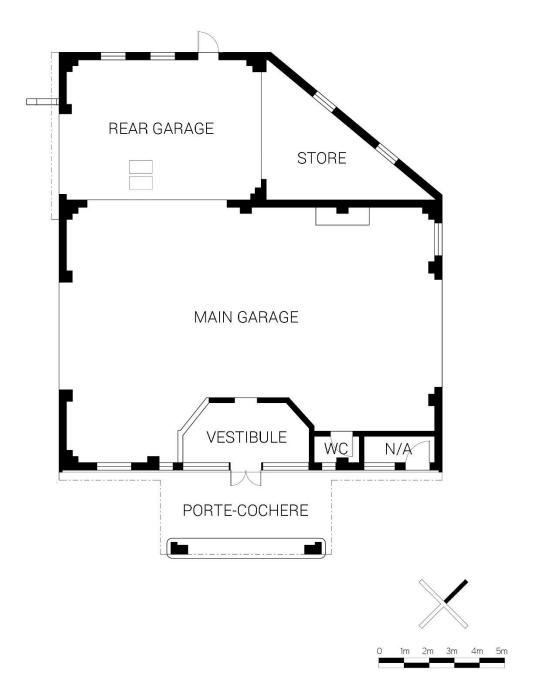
Plan of the building. Recent interior partitions are not shown for clarity. NBRS Architecture, February 2017.
